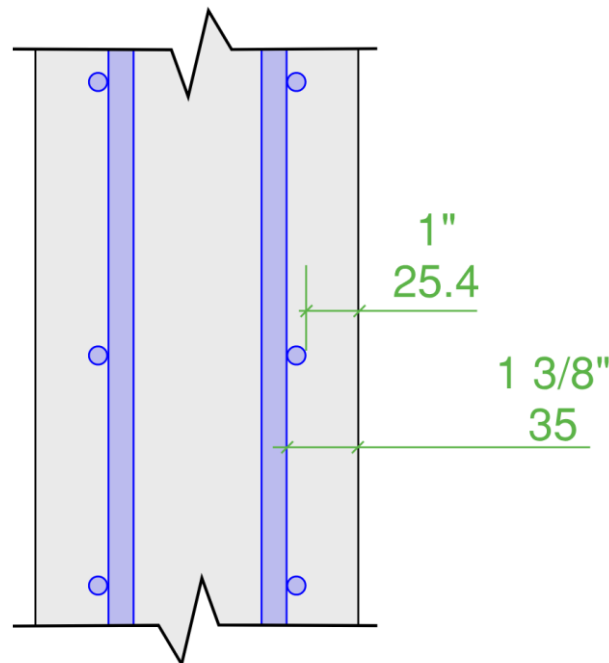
Pre-cast panel wall cross-section indicating typical bar configuration and cover for 6" wall
